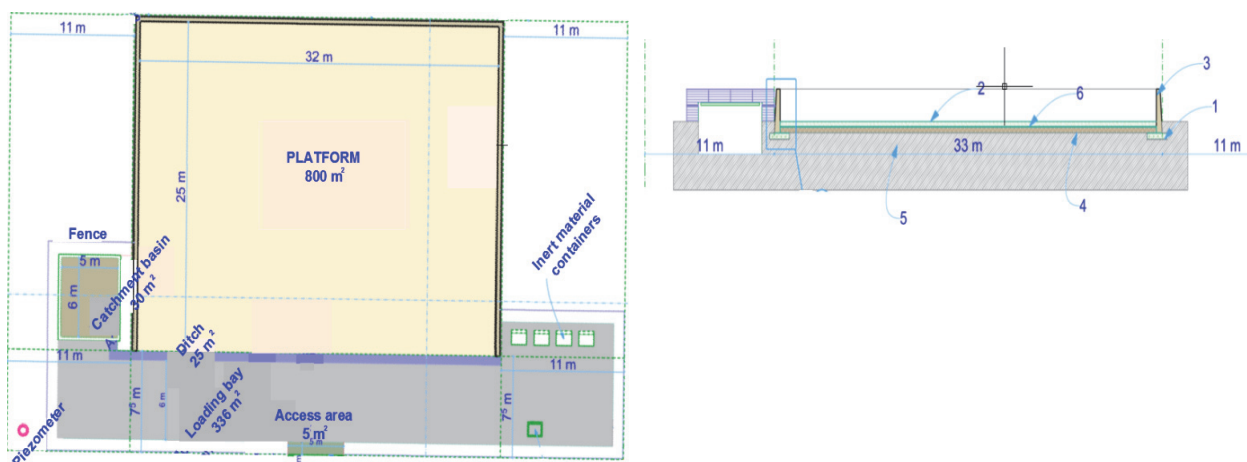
Components of the manure platform: 1 - reinforced concrete foundation, 2 - manure platform, 3 - reinforced concrete wall, 4 - ballast layer, 5 - natural land, 6 - membrane for waterproofing.
